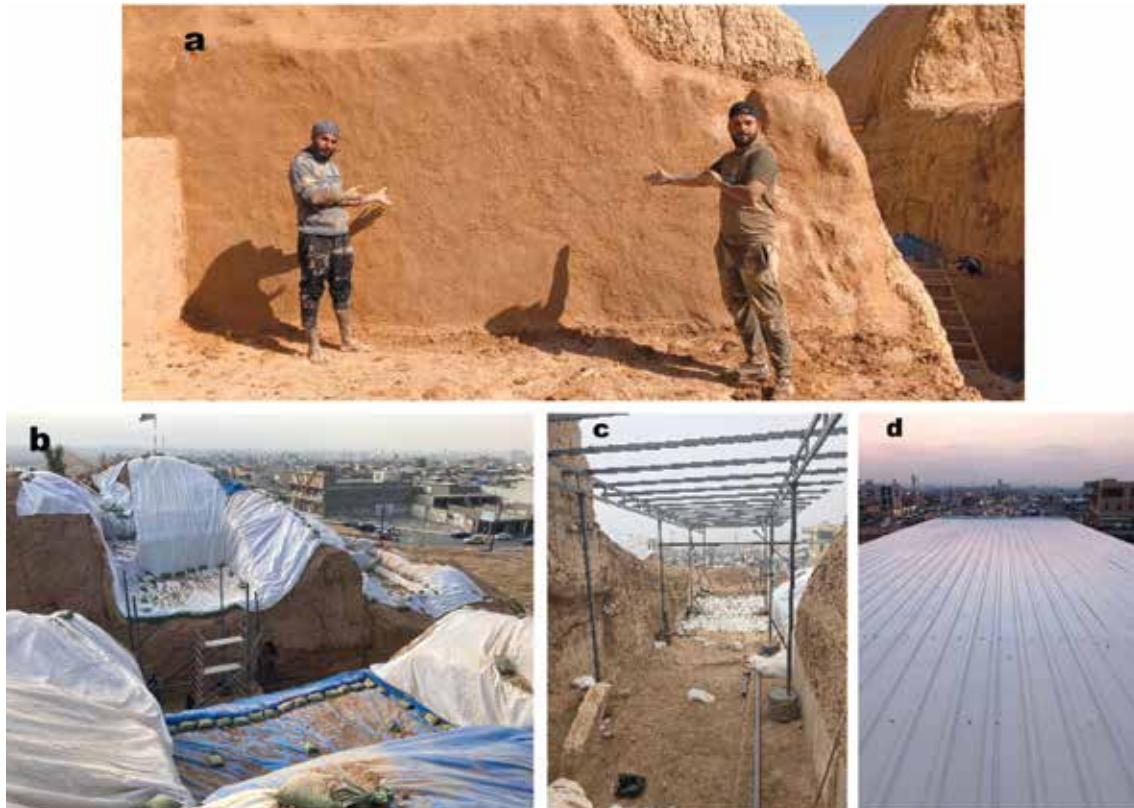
Plastering, covering, and roofing the Shamash Gate. Photos by K. Abu Jayyab.
